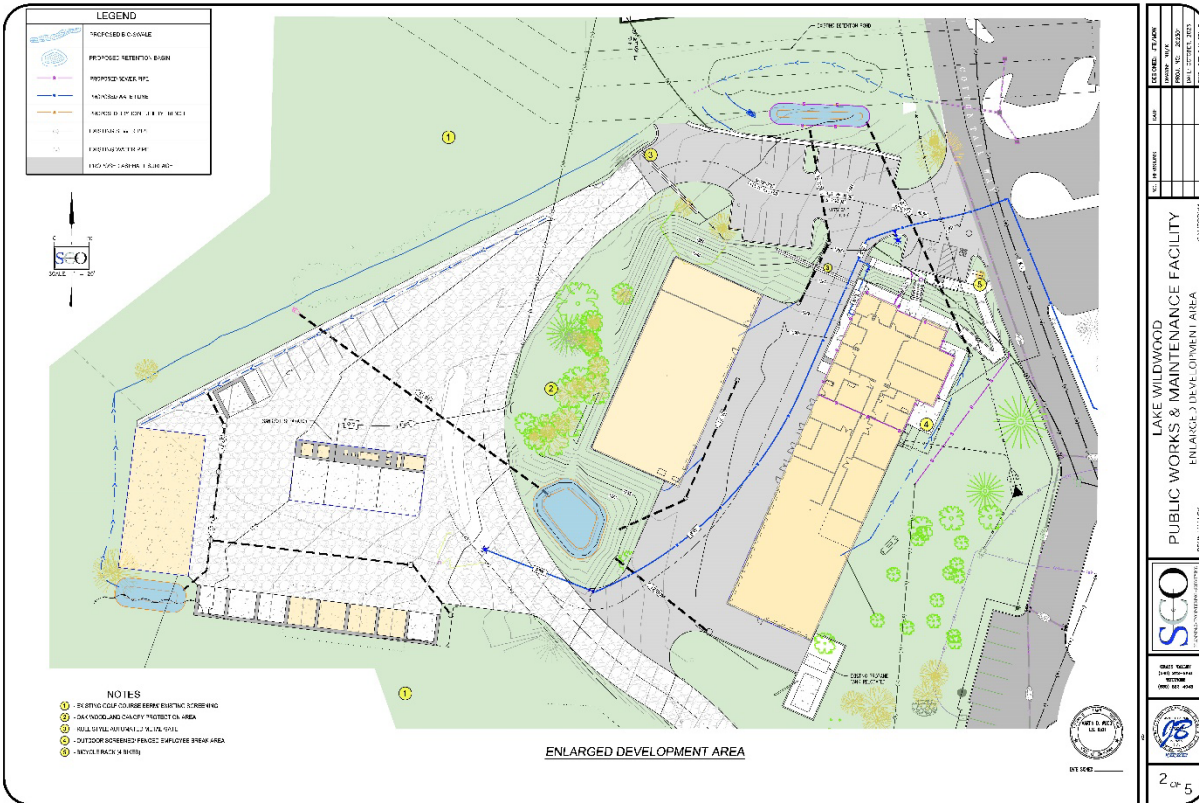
Enlarged Site Plan and Proposed Impervious Surface
